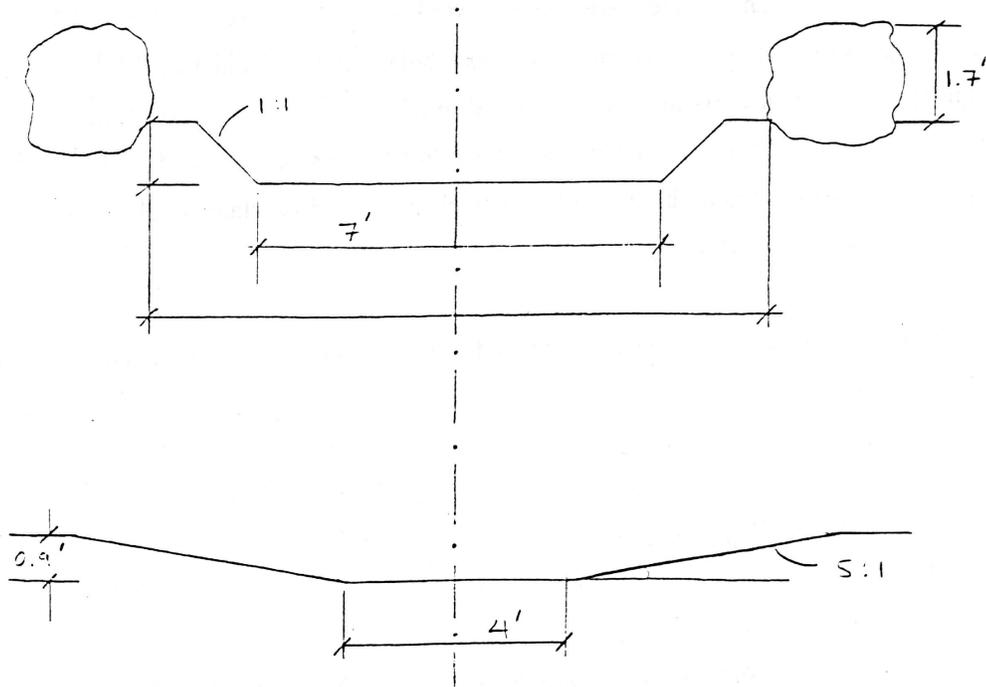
The channel cross-sections for the new swale (top diagram) and for the vegetated section of the old channel (bottom)
